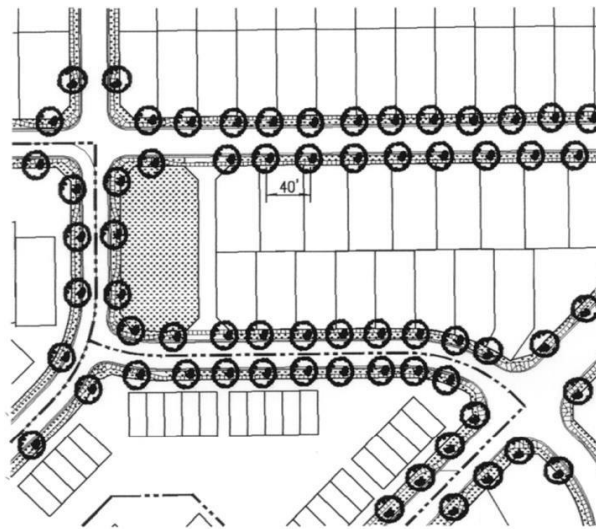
Example of one street tree provided every 40 feet on-center.
